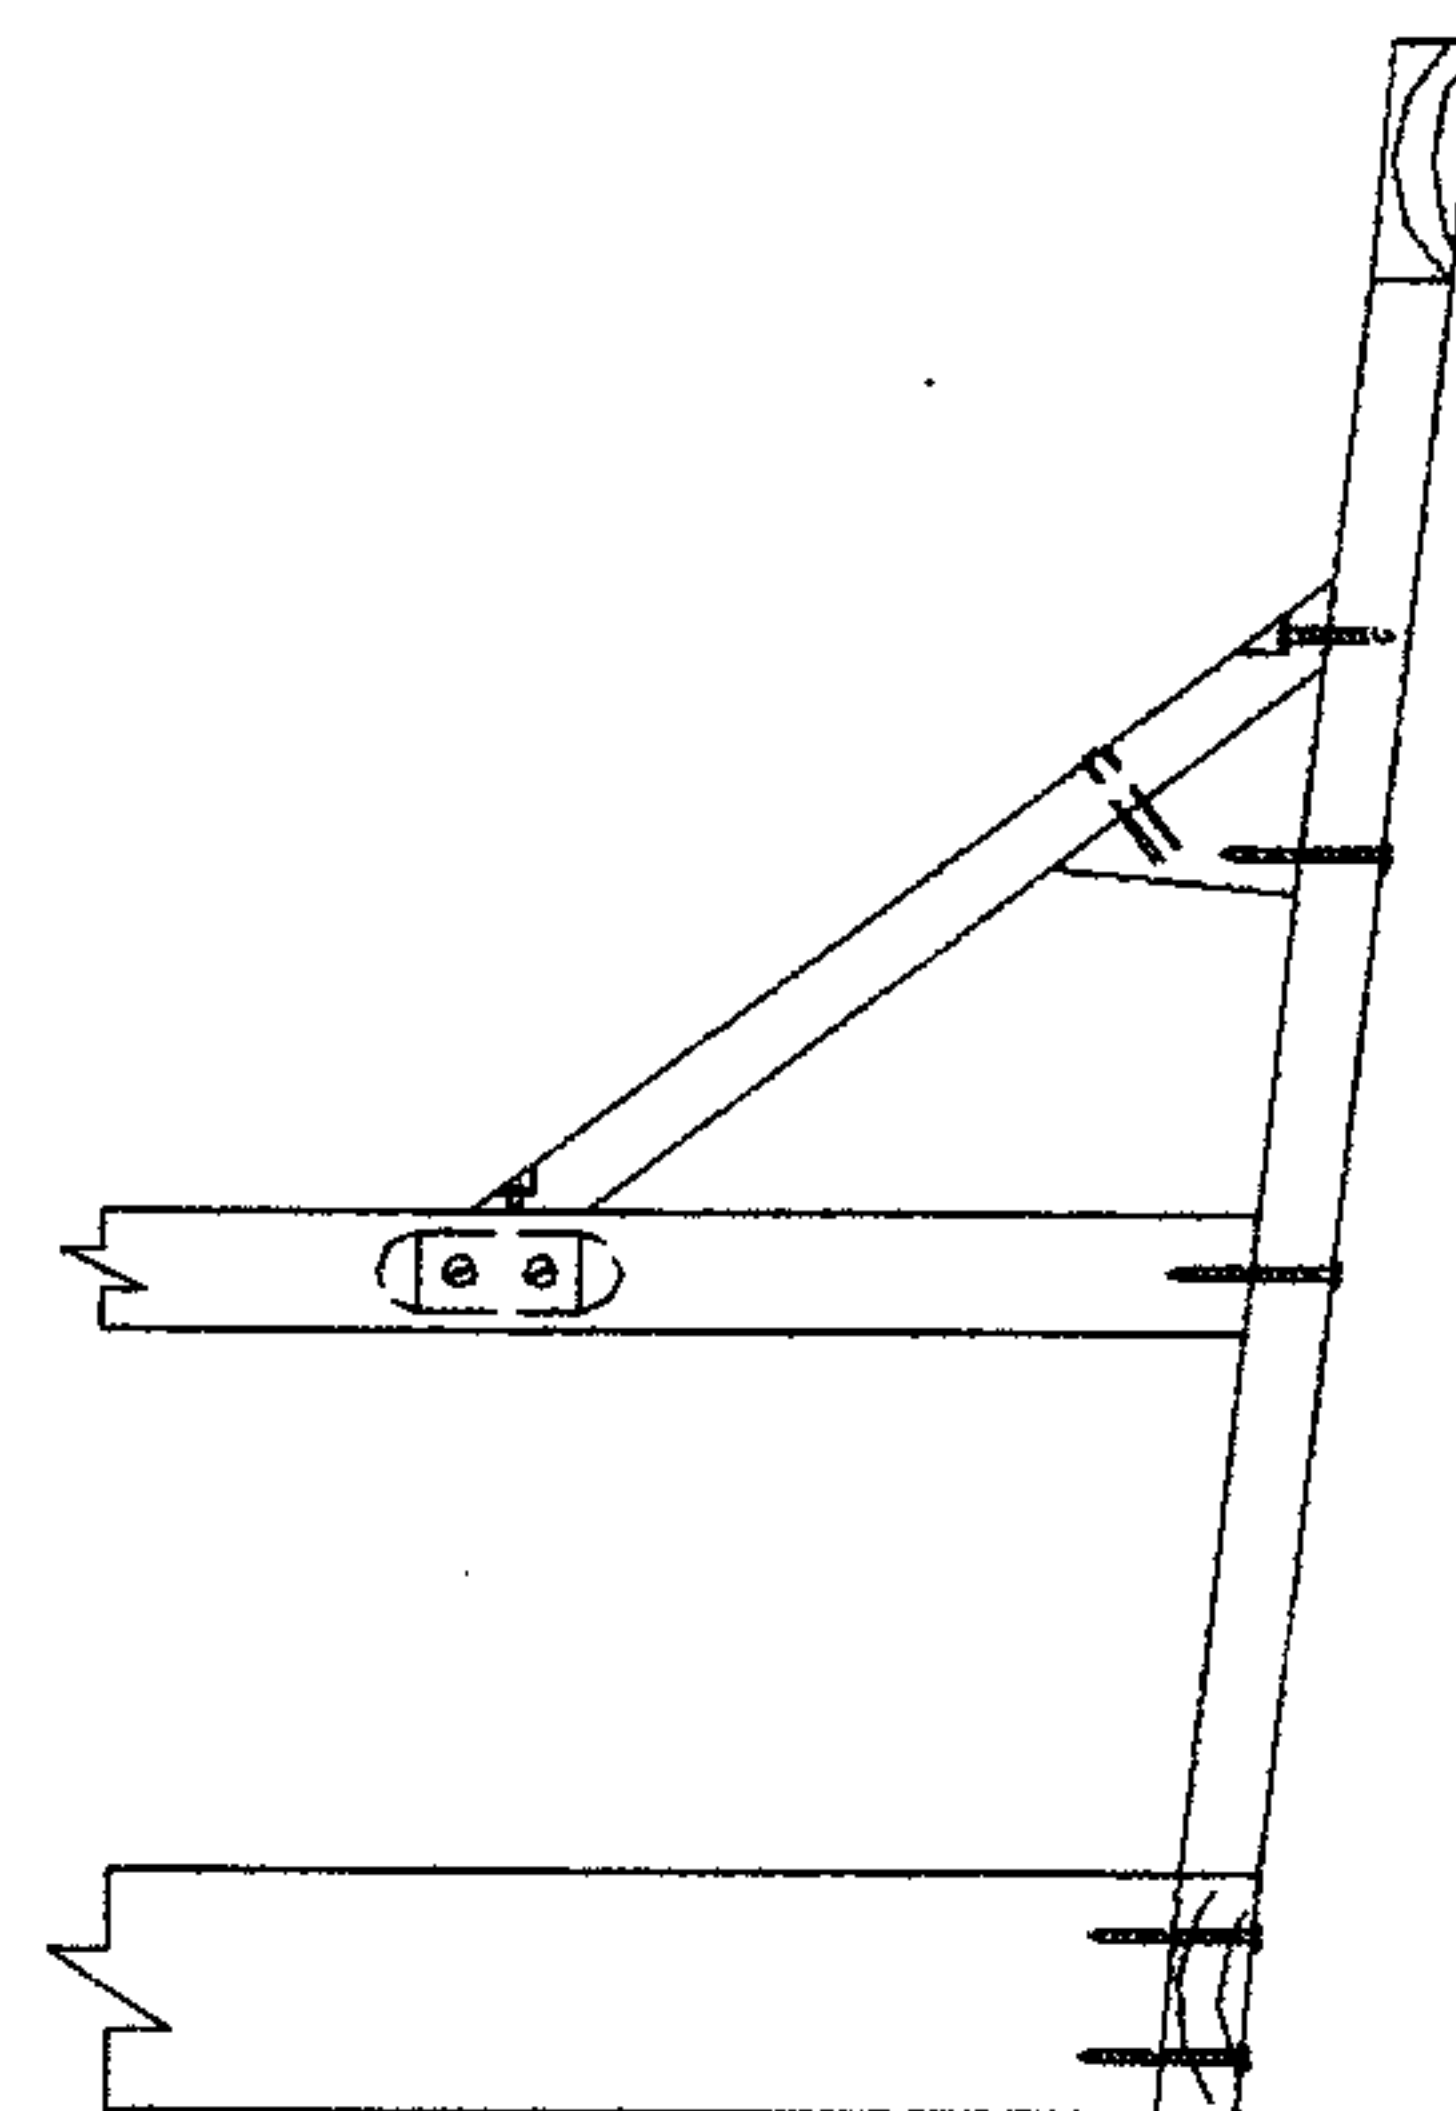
Drawing showing reinforcement of the center rail brace to interior upright connection.
